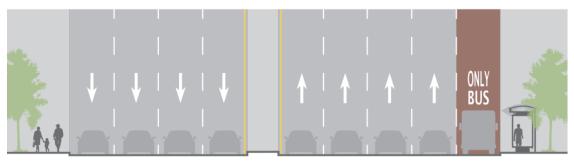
| Alternative 6 Cross-section of Boone Boulevard from Spring Hill Road to Chain Bridge Road
